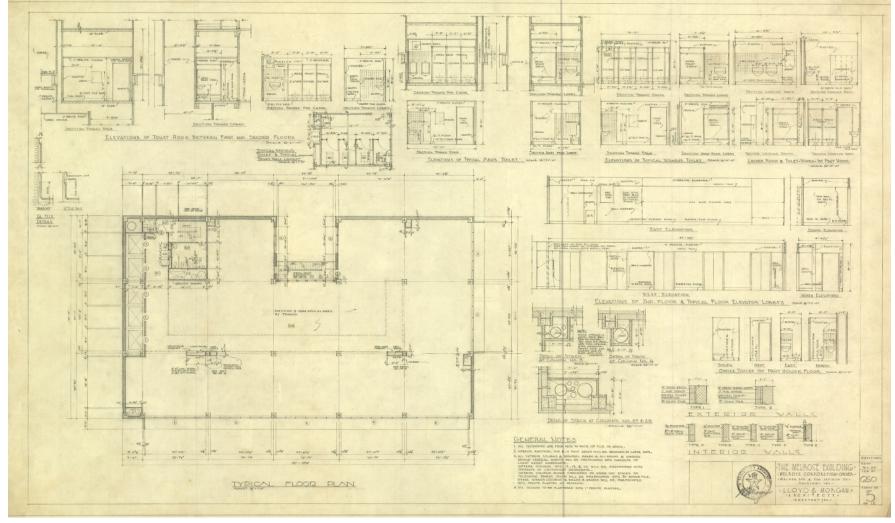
Melrose Building Typical Floor Plan, 1950, Courtesy of Houston Metropolitan Research Center, Houston Public Library.
